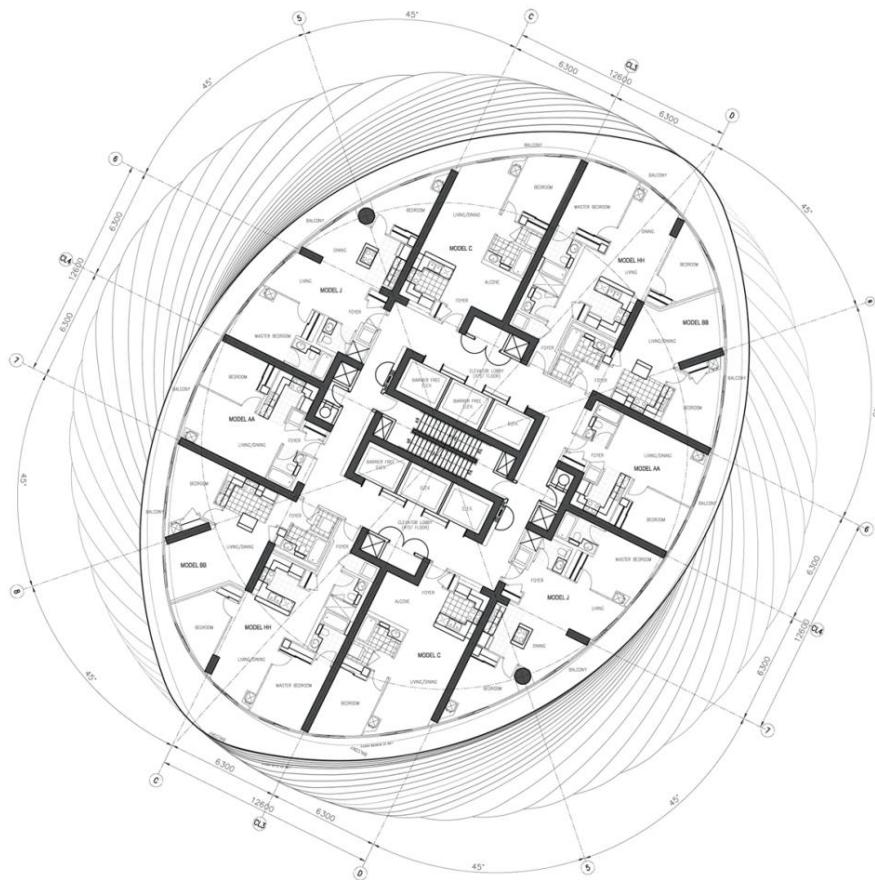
Absolute World Towers: plan of a typical floor (source: <http://www.dezeen.com/>)
